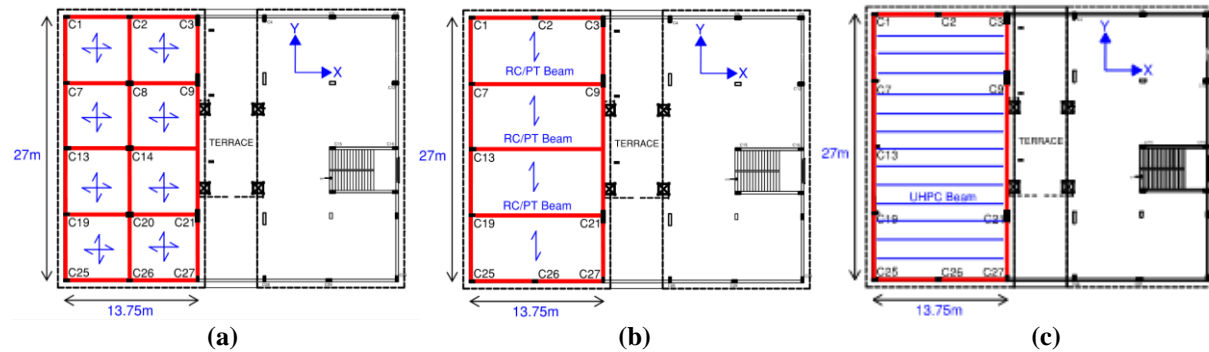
Topmost floor framing plan (a) Original framing plan with interior columns (b) Floor structural system option with 13.75m (45.1 ft) span RC or PT beams and no interior columns (c) Floor structural system with UHPC beams and no interior columns. (1 m = 3.28 ft)
